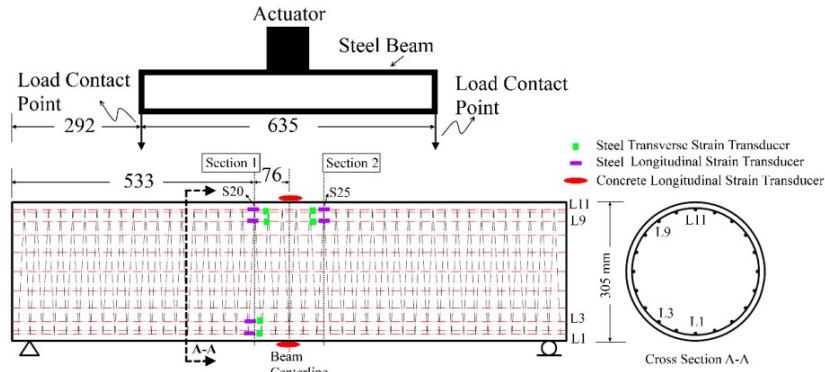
Instrumentation of RC beam specimen under four-point bending (dimensions are in mm)
